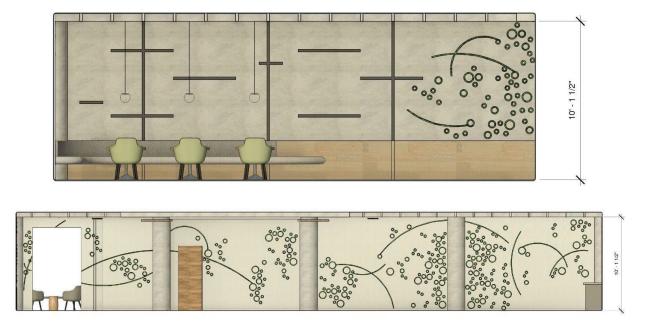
Lounge corridor and dining wall elevations. NTS.
